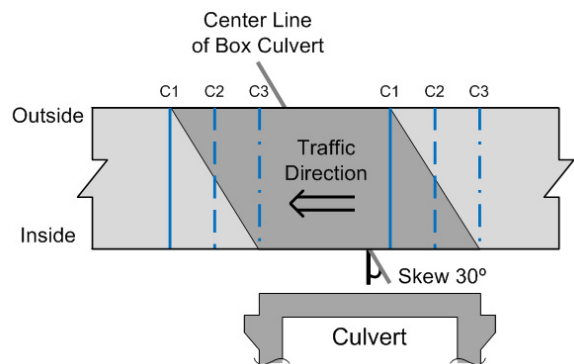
Joint Positions in Slab over 30° Skewed Box Culvert
